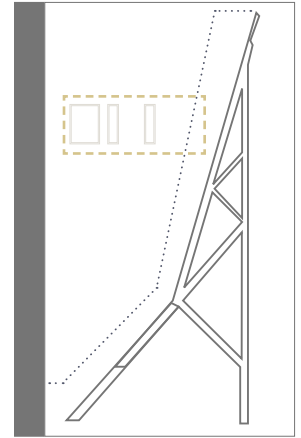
Lightshaft in art gallery concrete beam and steel roof connection
